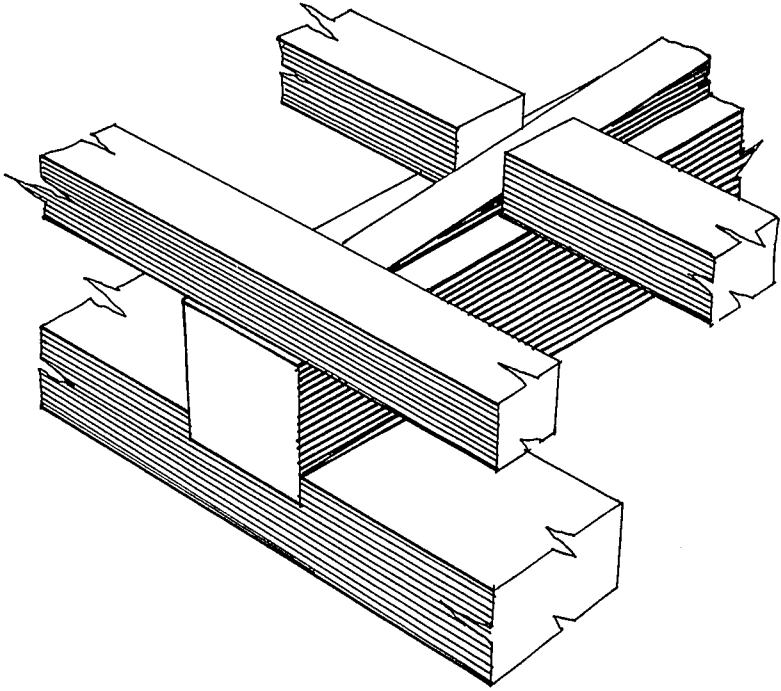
(a). Tie-beam at End, showing Camber rising between Ends of Joists.
